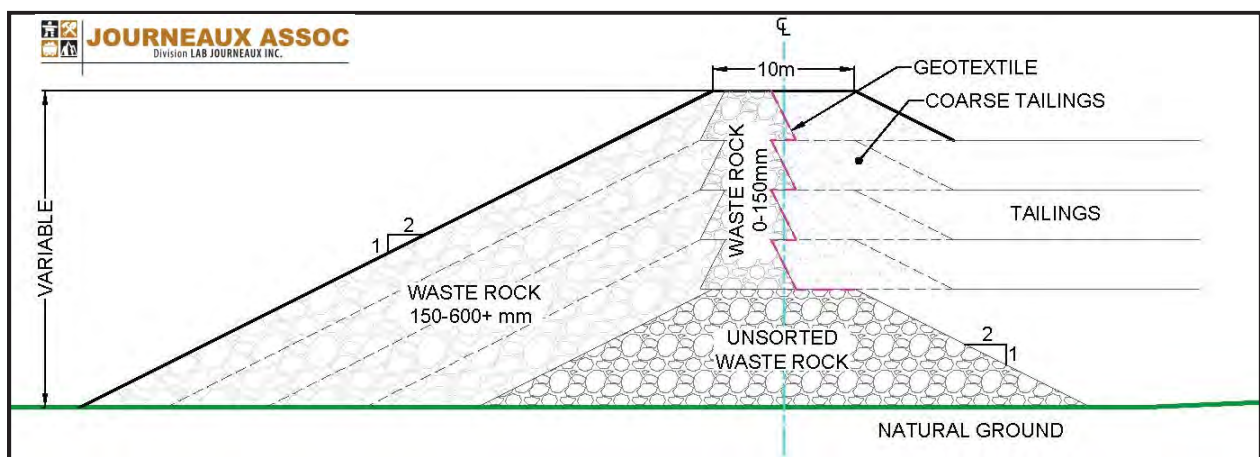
Typical section of a tailings dyke (center axis or centerline construction method)
